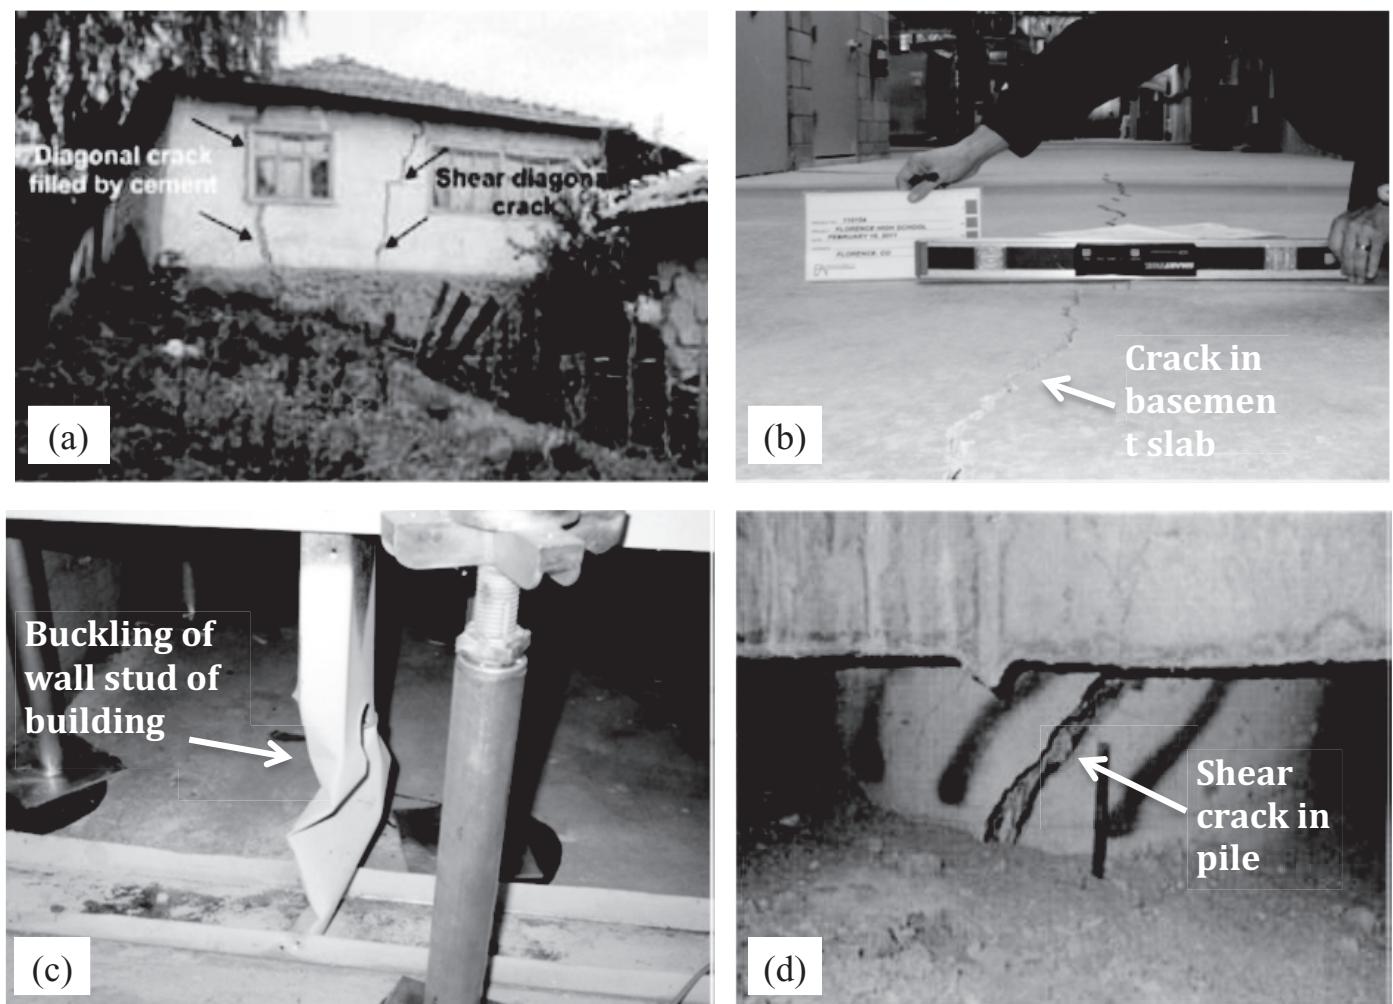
a-d: Damage of different structures due to change in volume of the expansive soils: (a) diagonal crack in wall; (b) horizontal crack in basement slab; (c) buckling of wall stud; and (d) shear crack in pile foundation (after Nelson et al. 2017)
